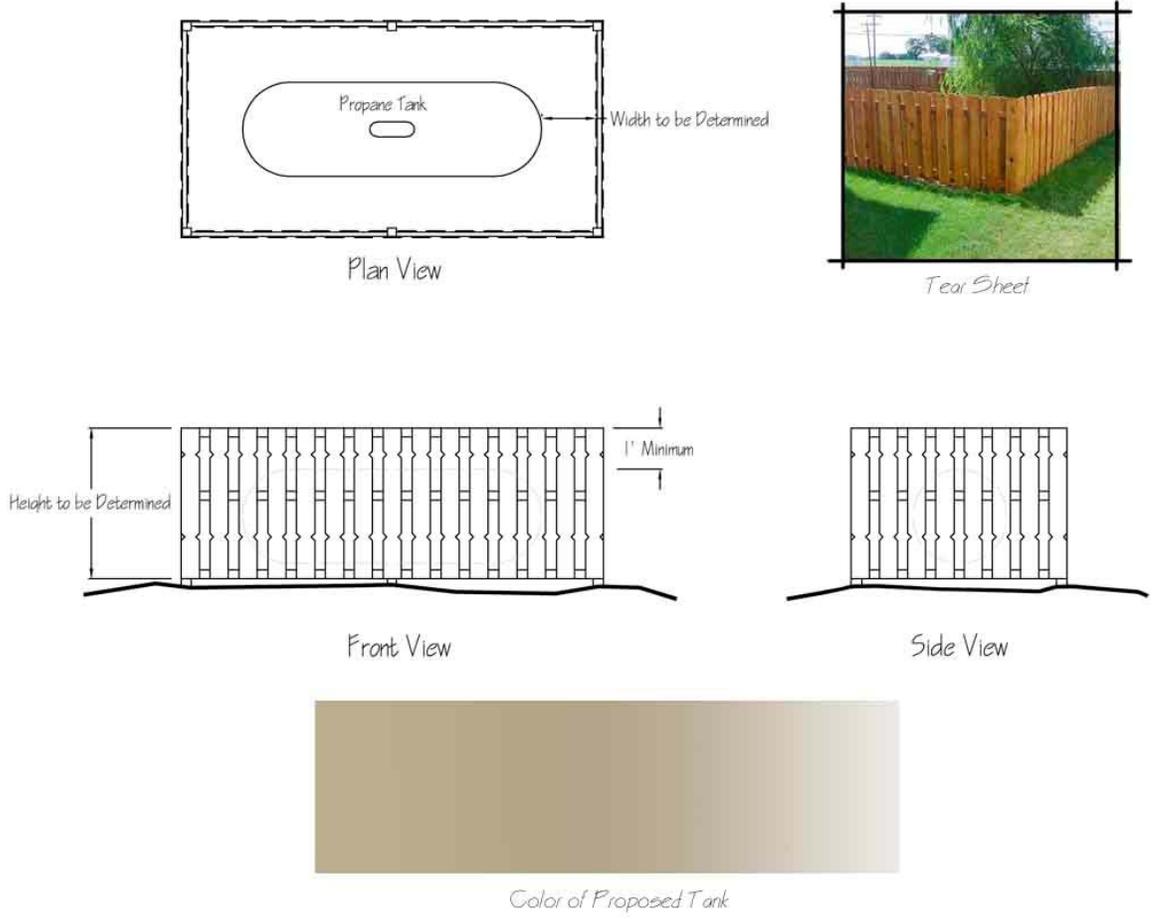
Drawings and photo of proposed fence type; Color swatch of proposed color range.
